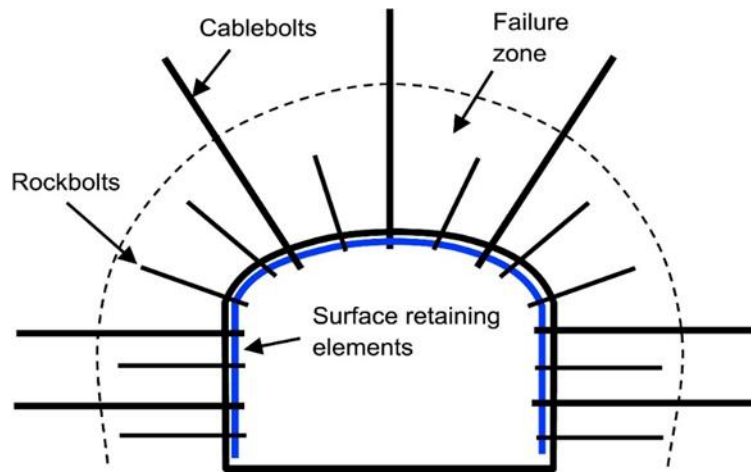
Principles of supporting tunnels in a weak rock mass
